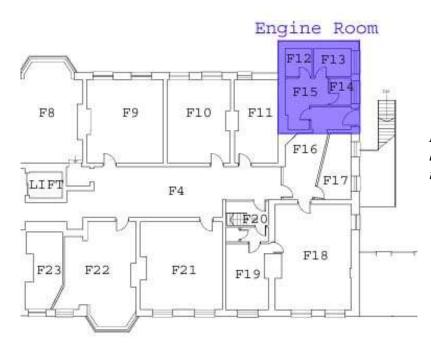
Plan showing the location of the engine room, in relation to the first-floor.
